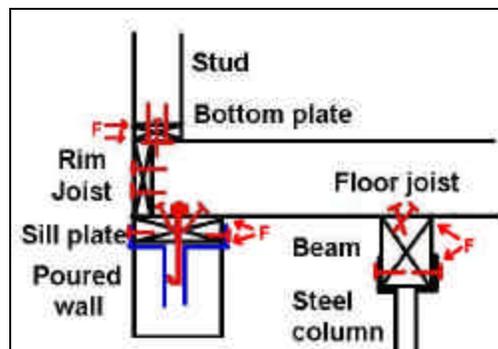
Typical cross section of a poured concrete wall foundation showing nailed and bolted connections with failure points (in red) and strapped connections (in blue). Center beam is wood or steel.
